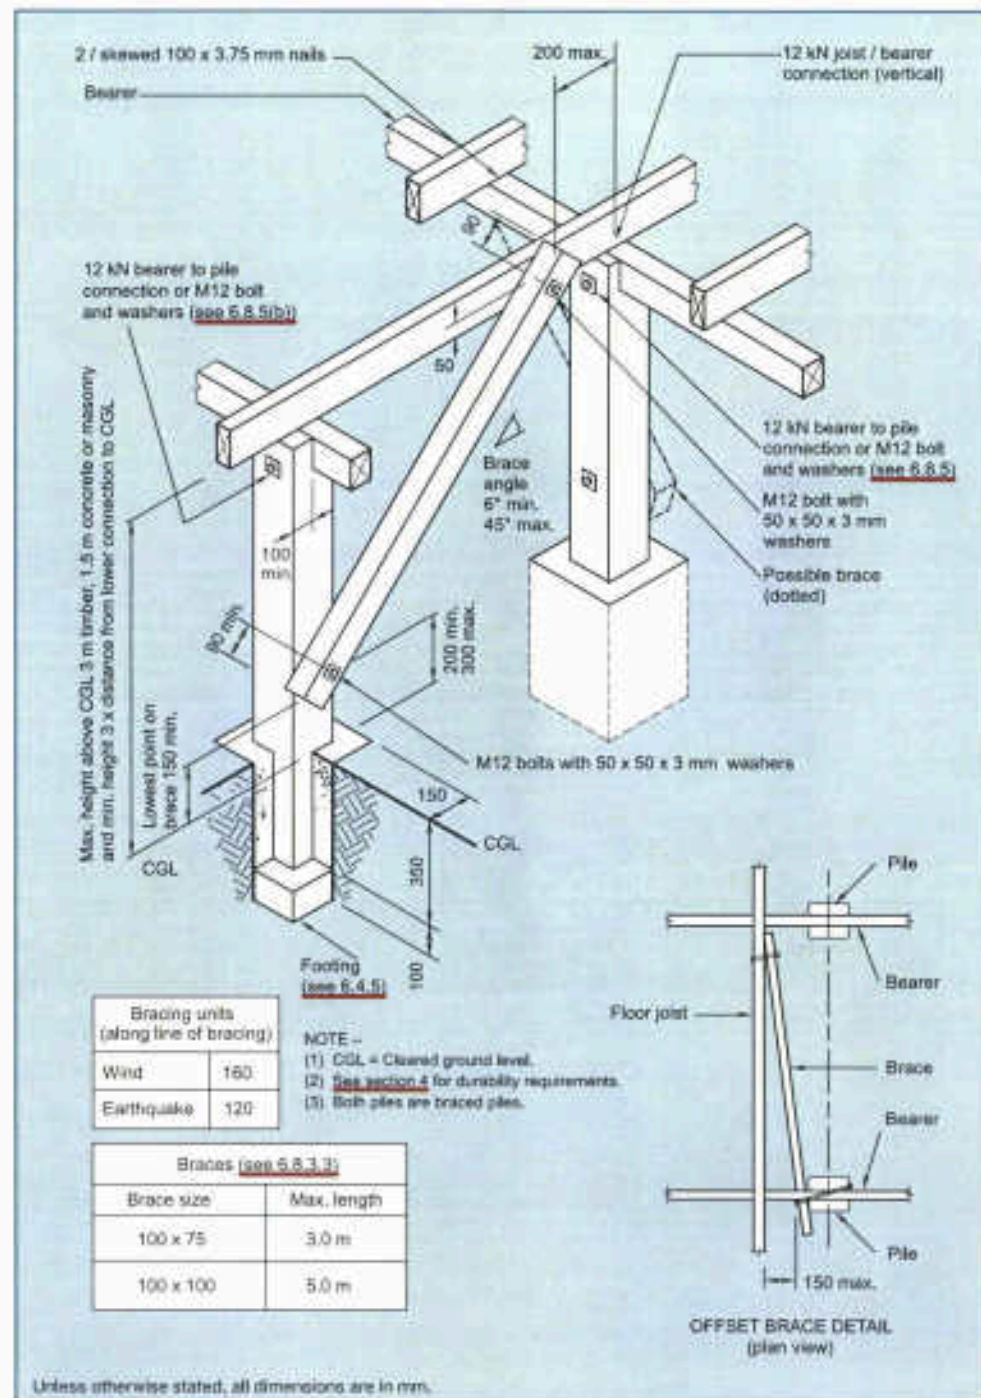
Braced pile system - Brace connected to joist (see 6.8)
